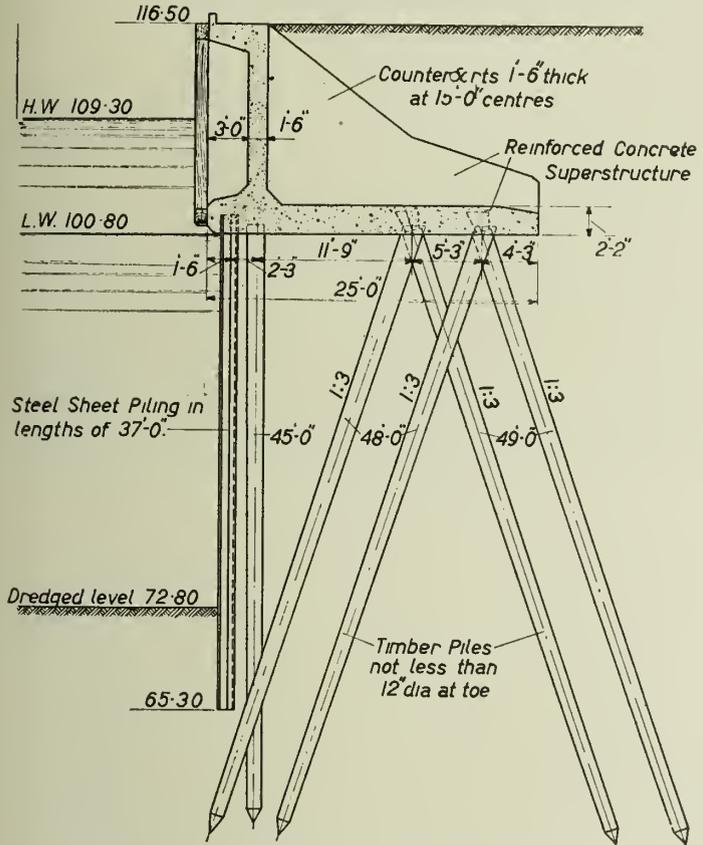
Typical Cross Section Through No. 1 Quay, Port Adelaide Development.
